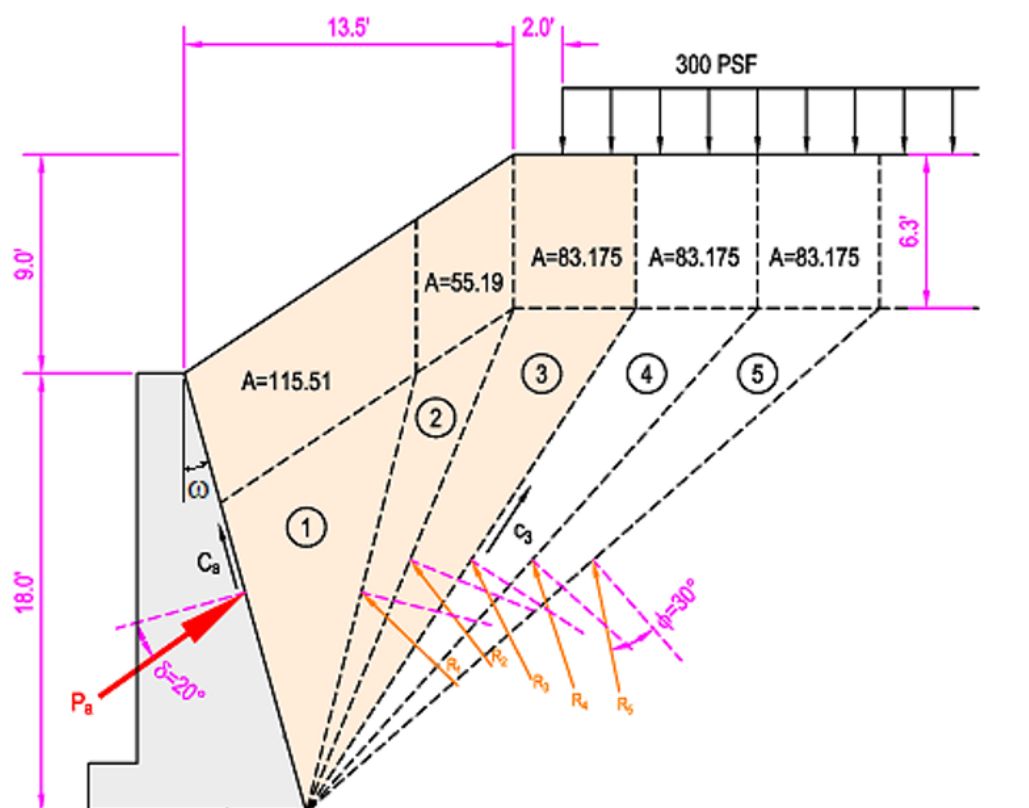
Retaining Wall with Irregular Backfill by Culmann Method
